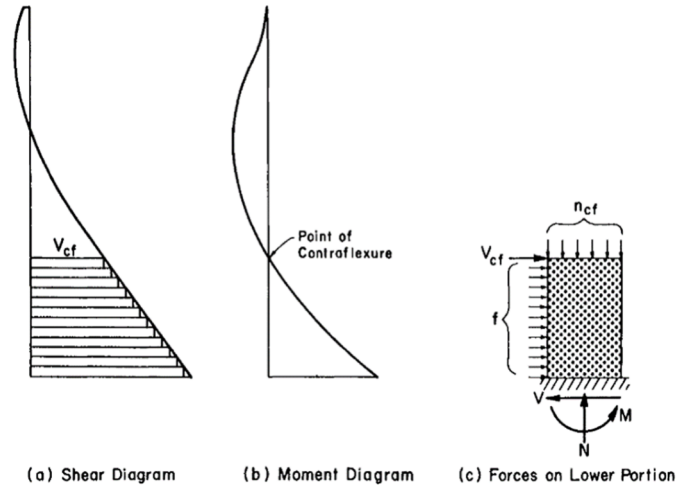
Shear and Moment Diagrams for a Typical High-Rise wall, Translated to an Equivalent Model for a Shorter Wall, Cardenas & Magura (1973)
